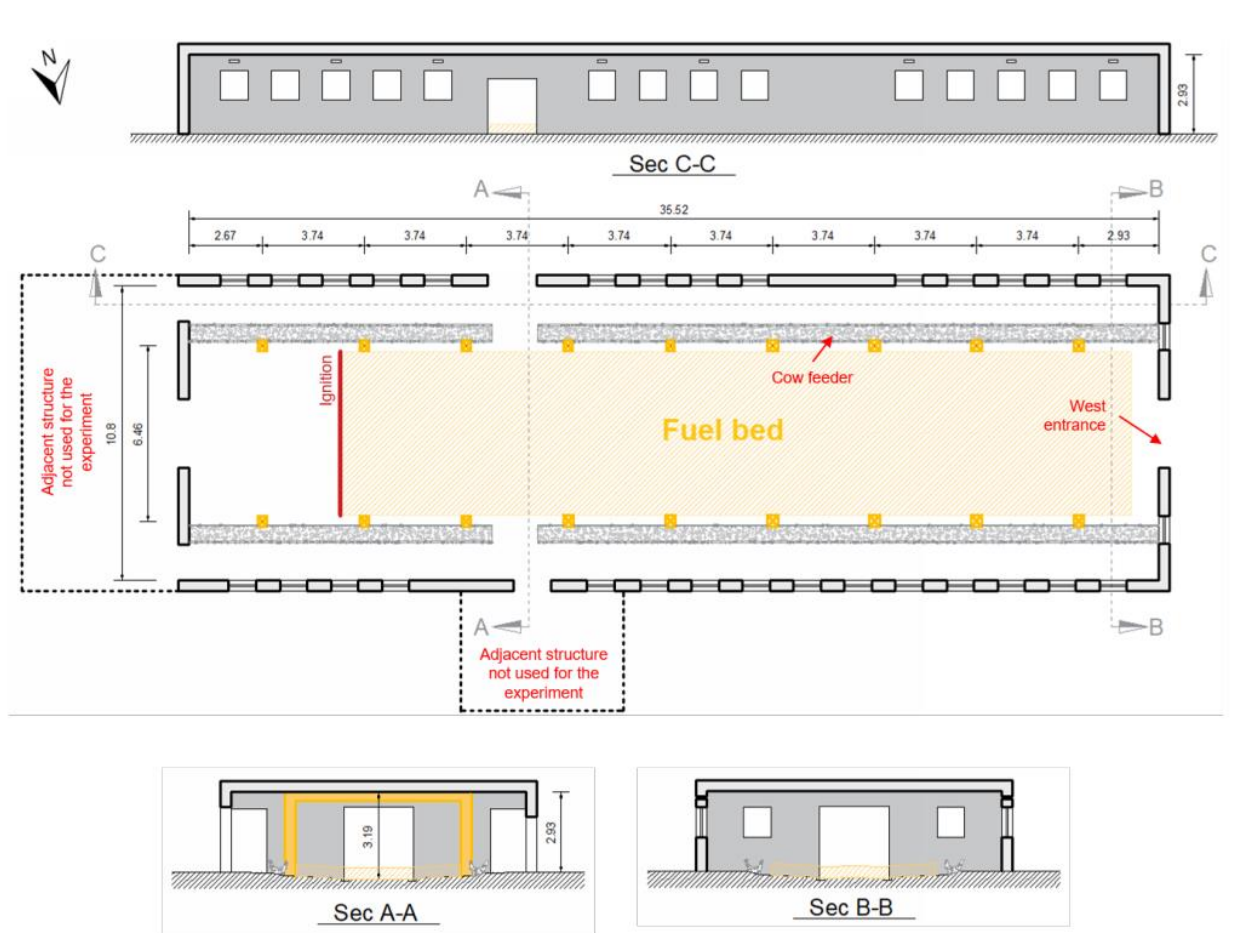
Floor Plan and Sections of the Compartment used for x-One and x-Two in Poland (excerpt from [26]).
